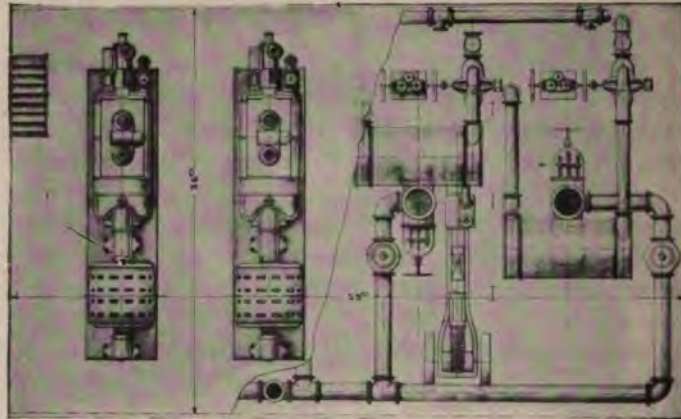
POWER-HOUSE CONTAINING FOUR 1000-KW WESTINGHOUSE-PARSONS STEAM TURBINES AND CONDENSERS, PLAN
